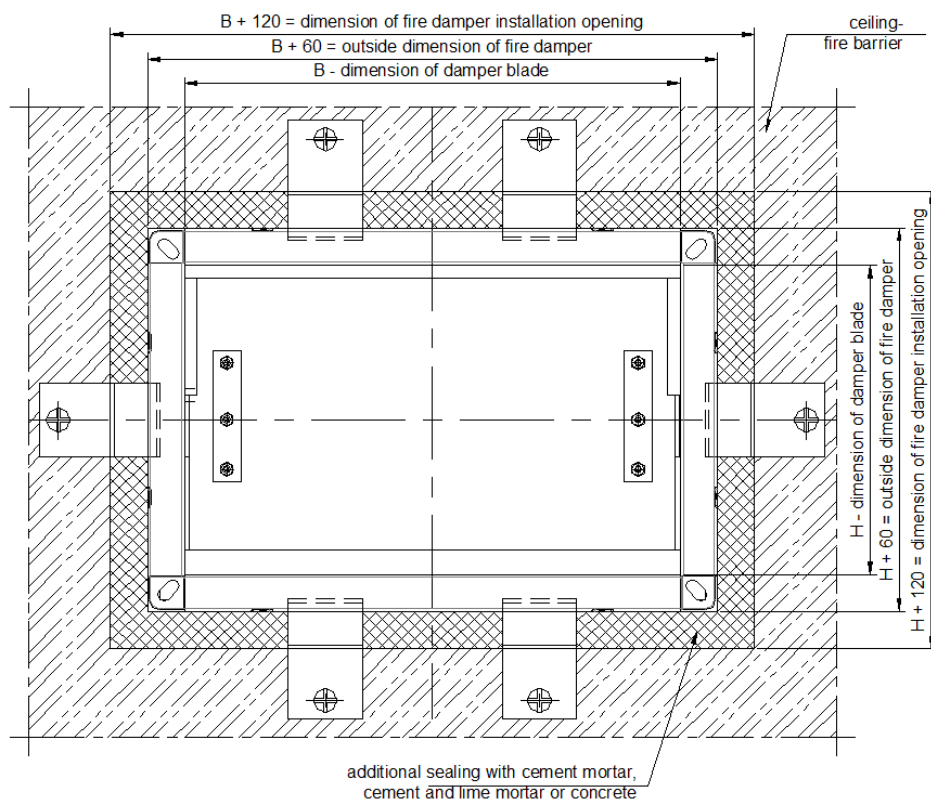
Installation method of fire damper KWP-0-(E)S in rigid compartment – ceiling
